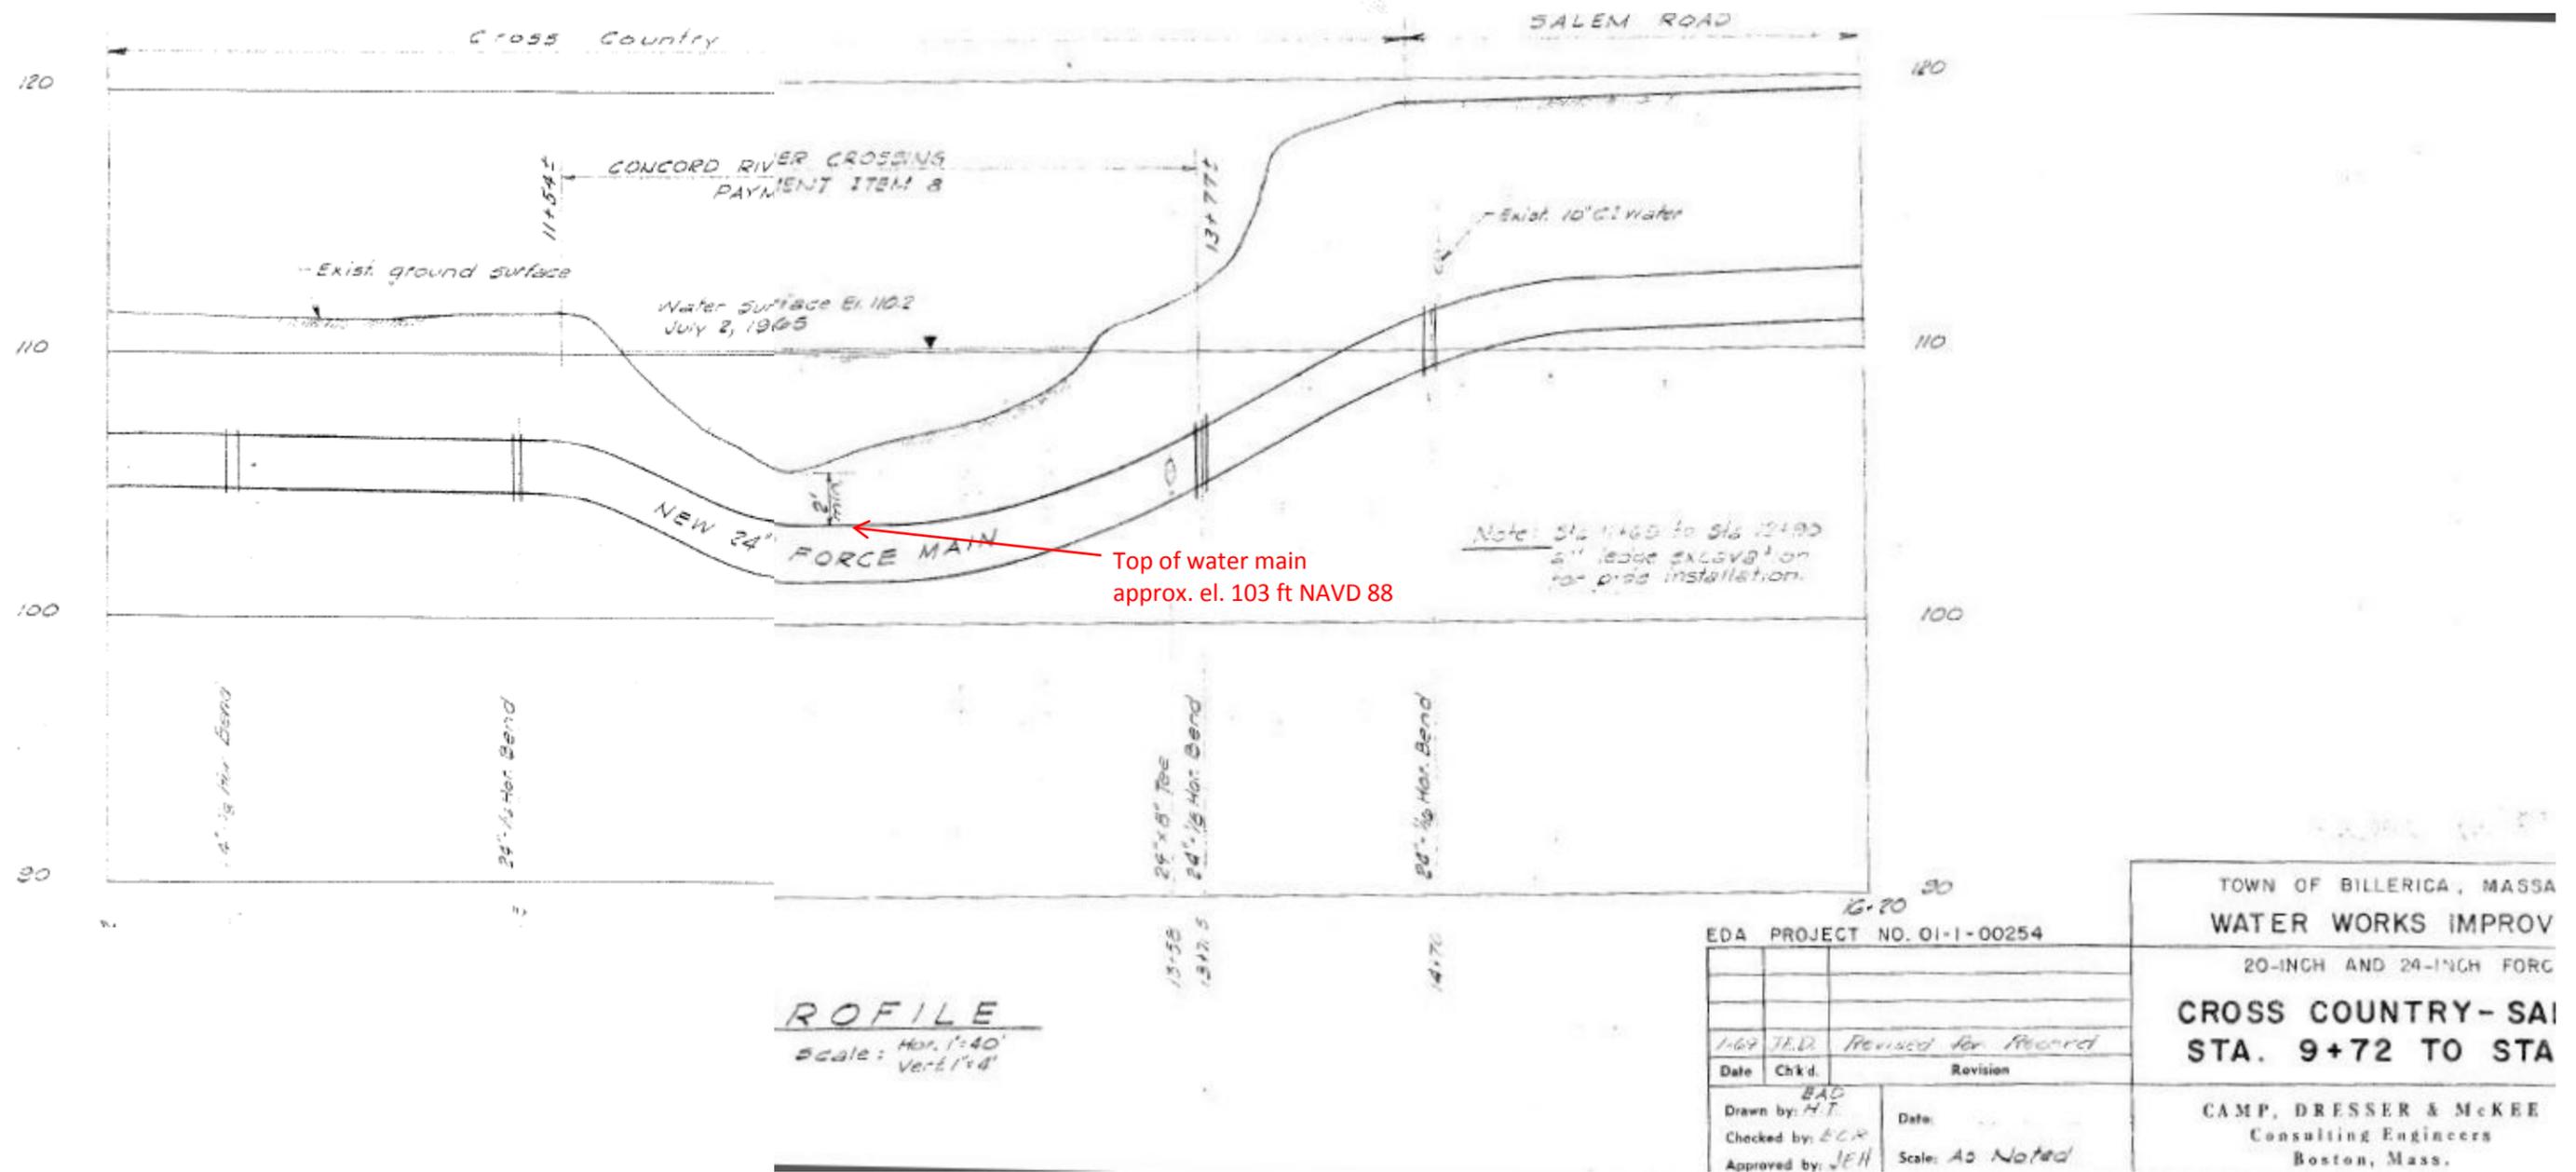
Billerica Sewer Main Crossing Plan and Profile
